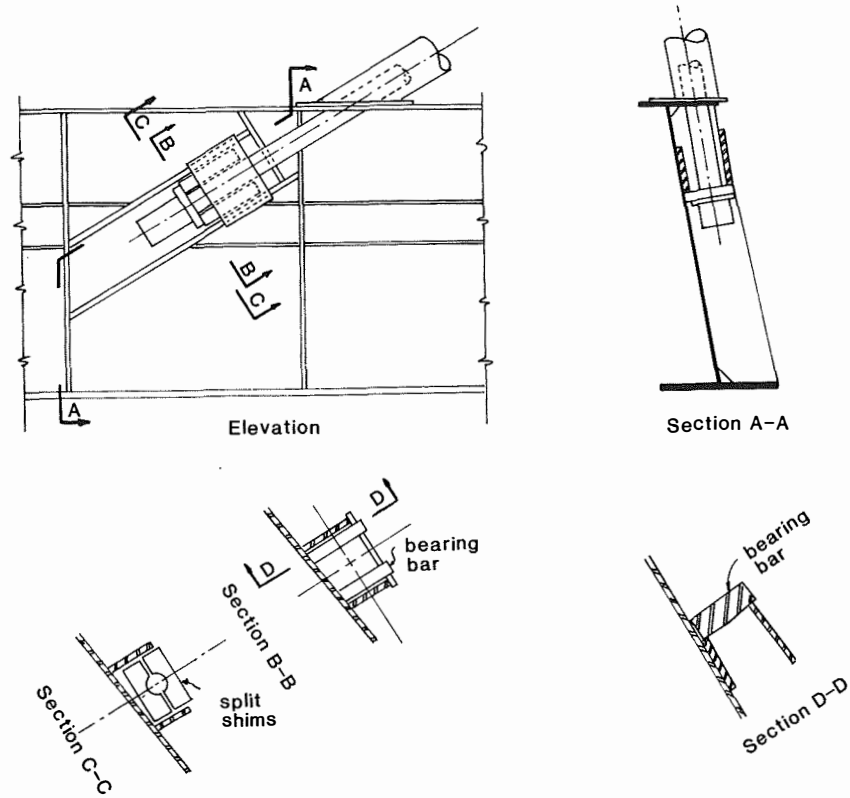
Weirton-Steubenville Bridge, stay anchorage detail at deck.
